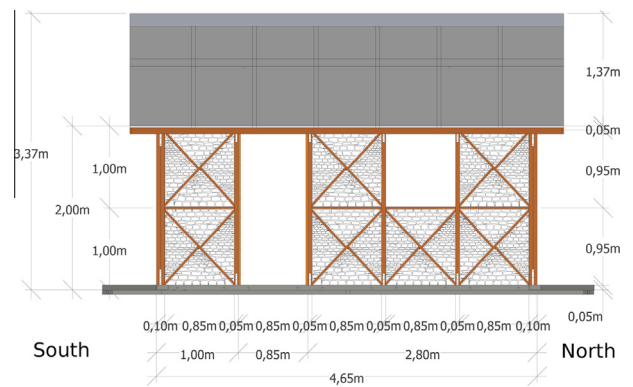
Dimensions of the wall recorded by camera (East shear wall).
